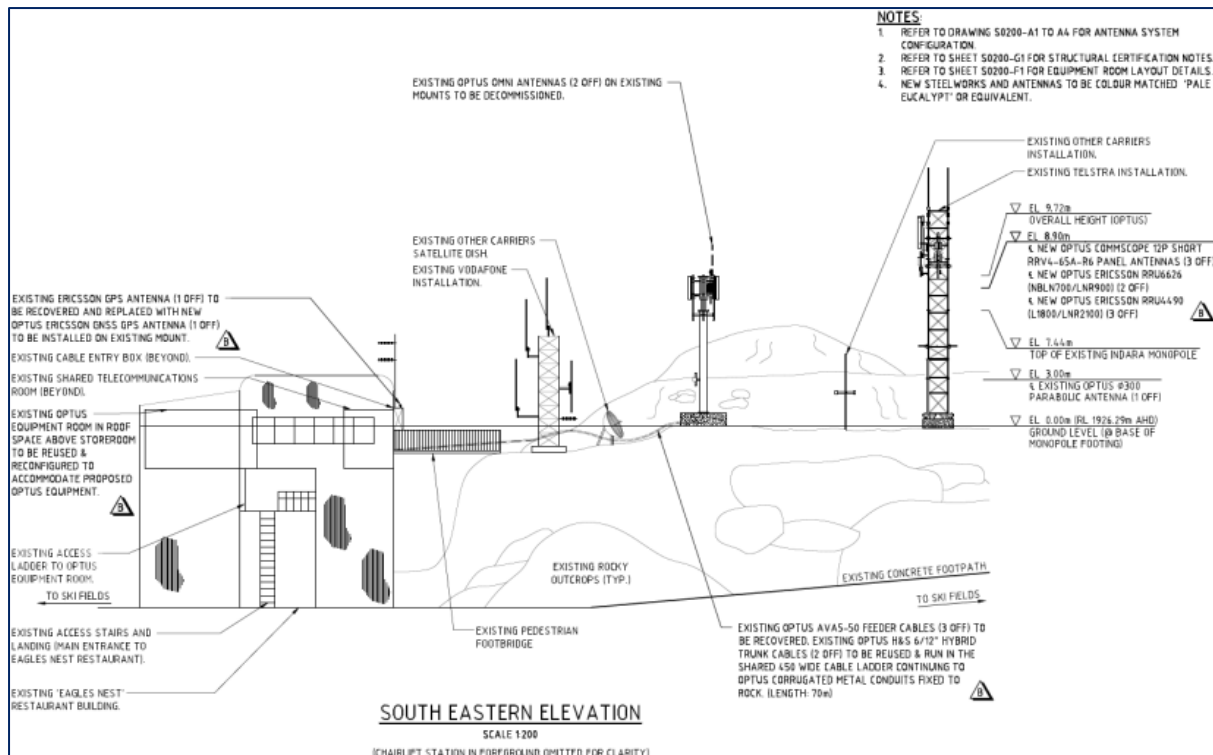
| Elevation of Optus tower and adjoining installations (Source: Applicant’s documentation)
